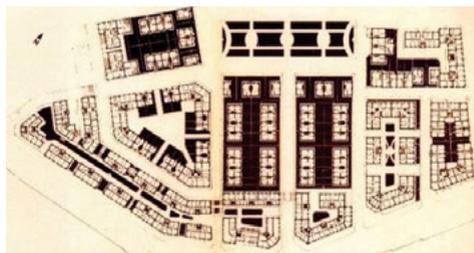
Ground Floor Plan of the district San Saba in Rome.
